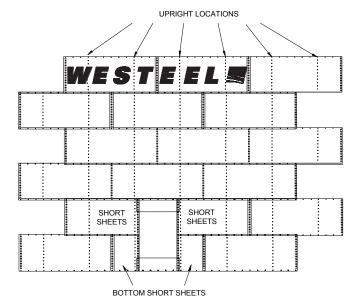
Stencil and Short Sheet Placement — Even Tiered Bins
